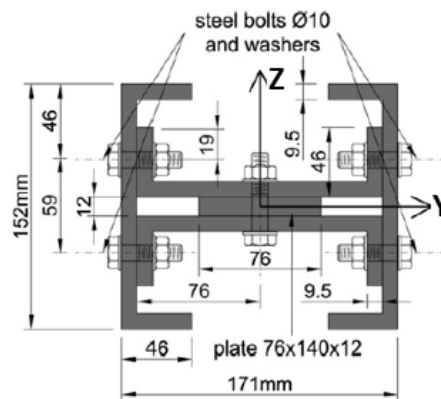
Built-up cross-section composed of four C-profiles (Russo, 2012)
